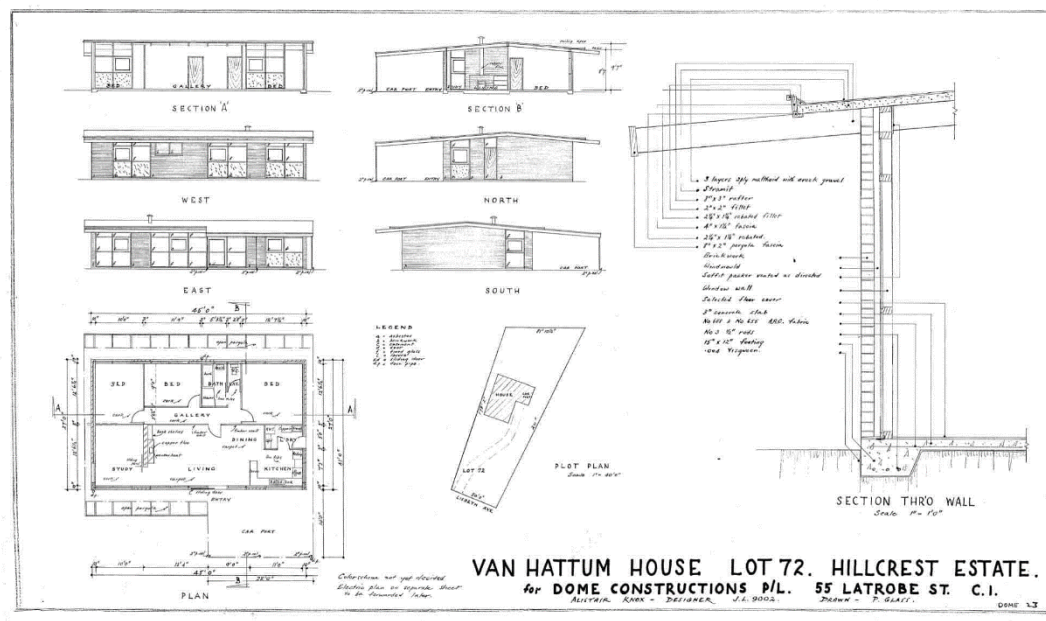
Van Hattum House, Lot 72, Hillcrest Estate, Alistair Knox designer, drawn by P Glass (Alistair Knox Foundation) for Dome Construction [nd]. (Source: Alistair Knox Foundation)
